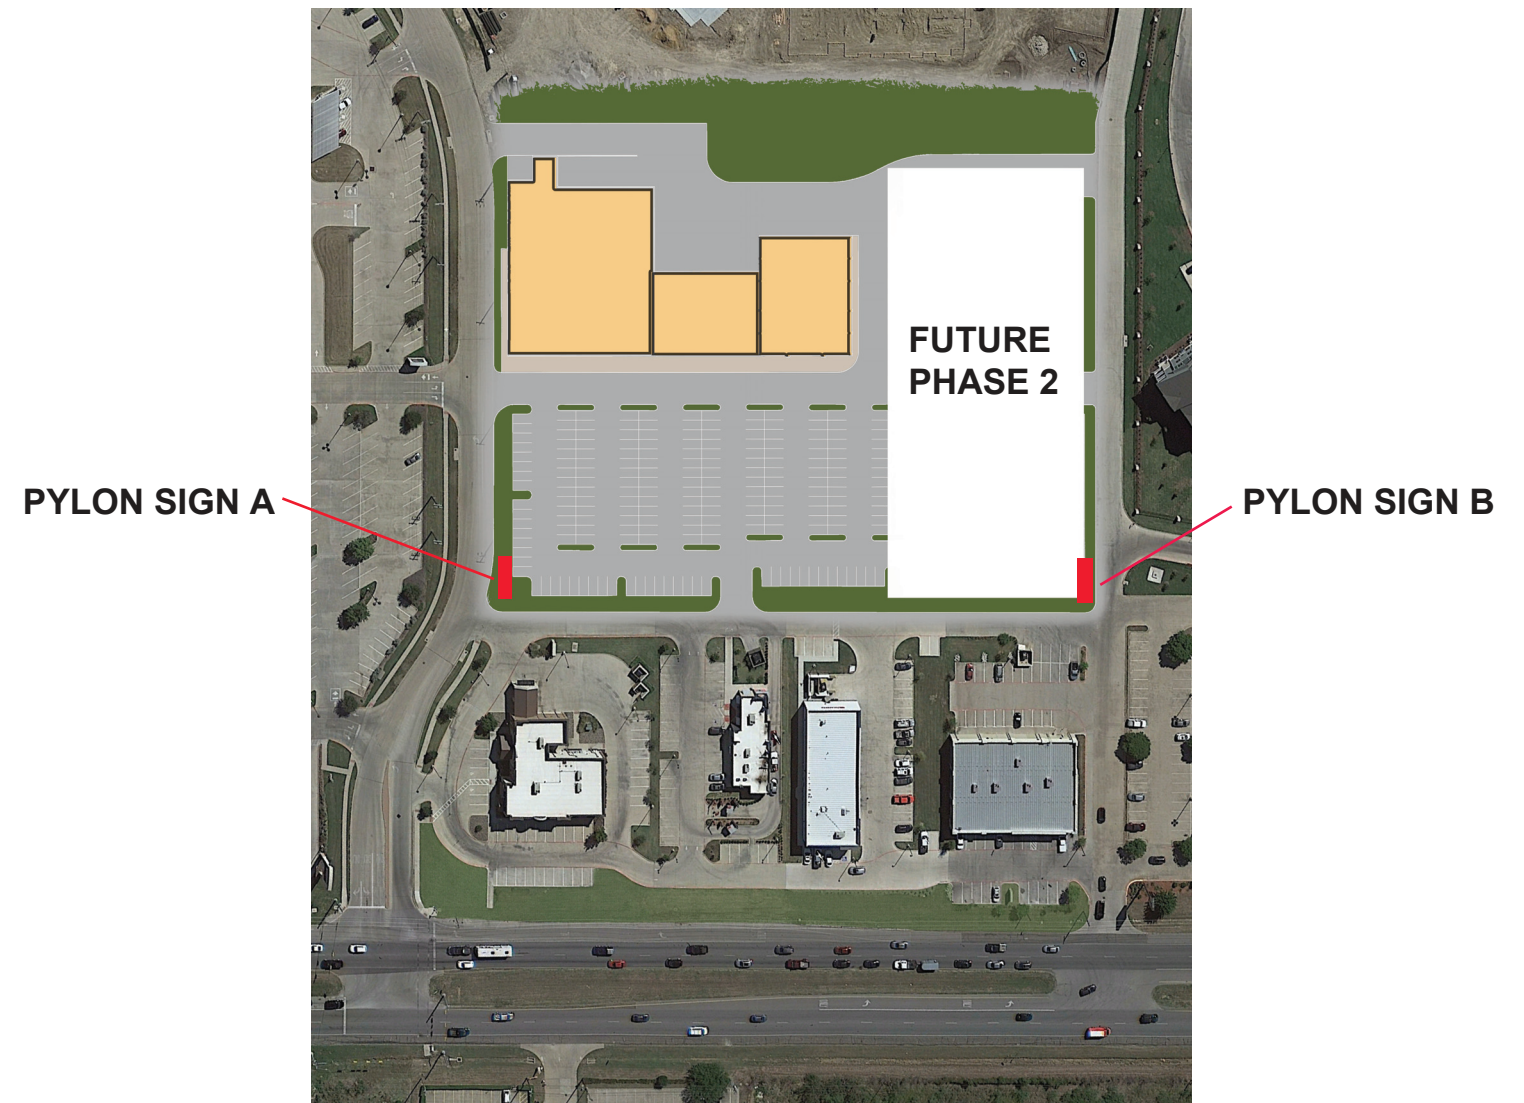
EXHIBIT A - CONCEPTUAL PLAN AND PYLON SIGN RENDERINGS
